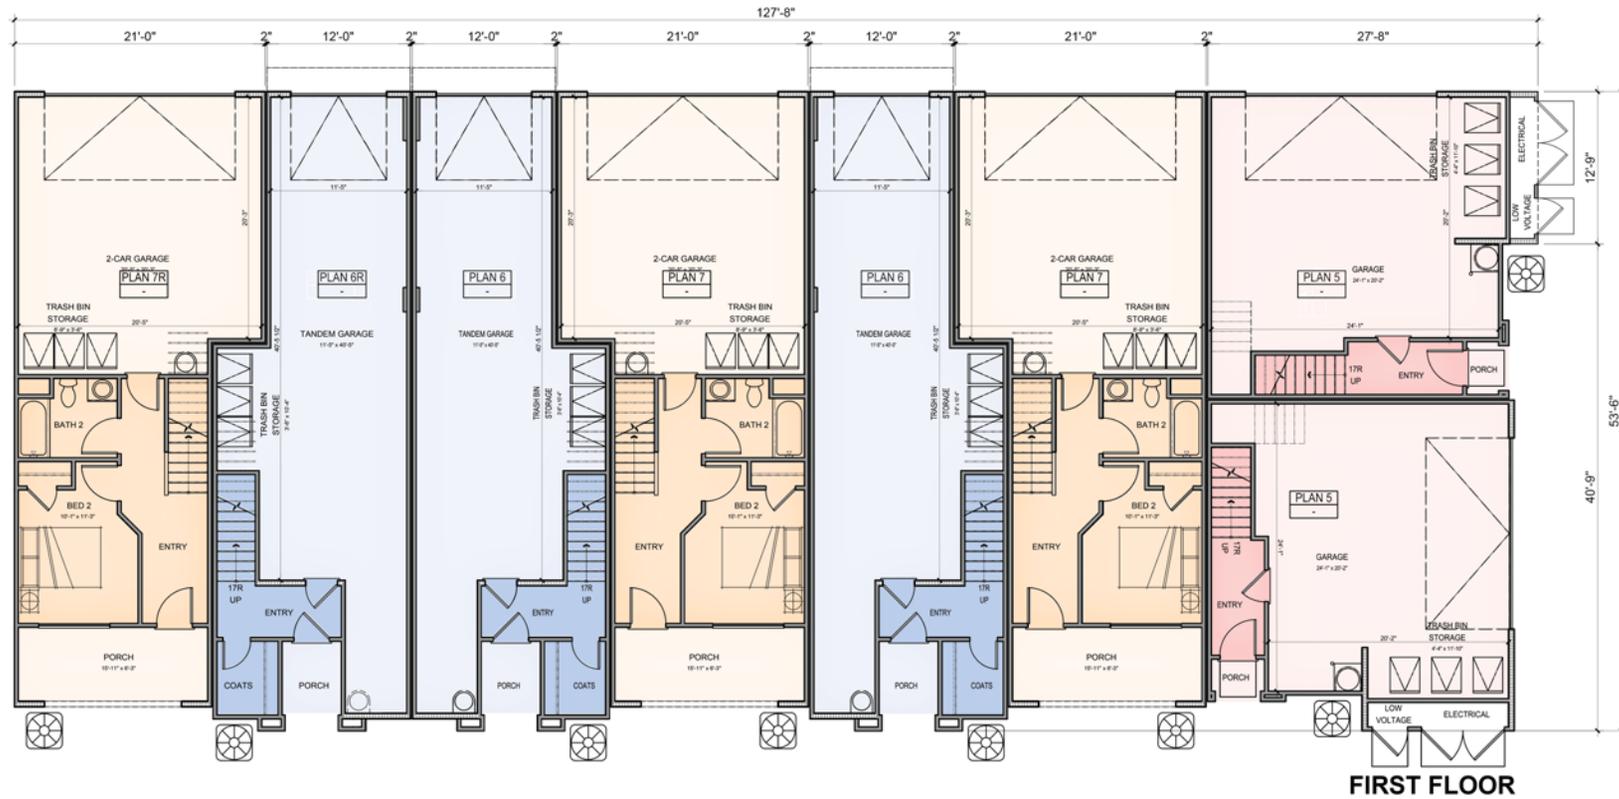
Composite C (8-Plex) Townhome Floor Plans
